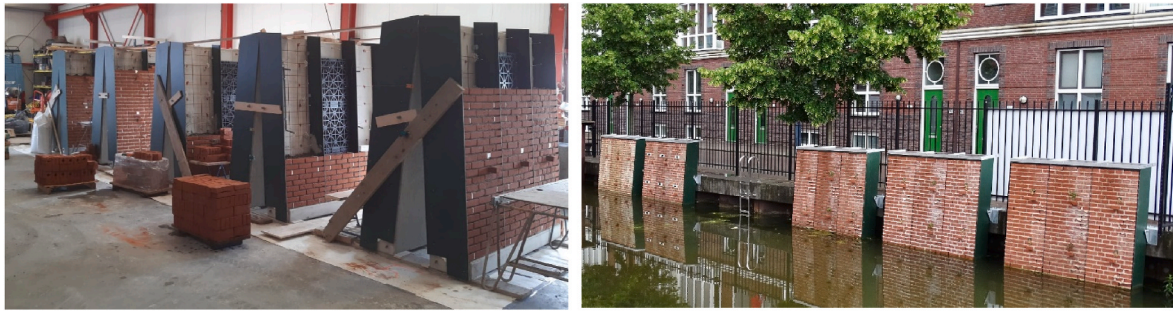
left: Building of the walls; in the middle panel space between the masonry and the concrete slab is left for pouring of the substrate (the plastic containers had only a safety function); right: South facing walls placed at test location.
